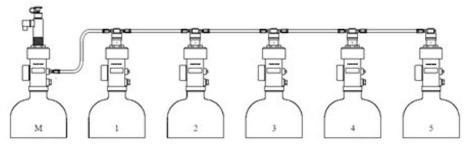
Maximum Number of Pneumatic Actuator for Welded Cylinders
